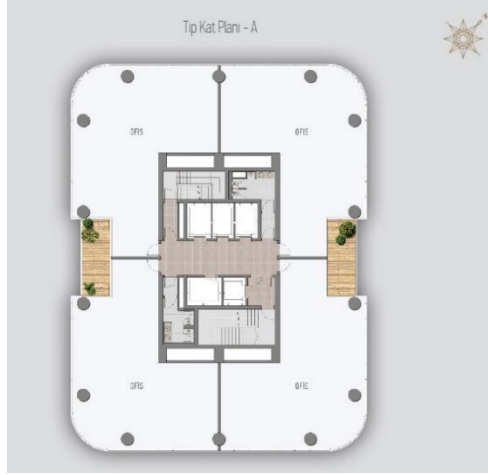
Plan of Besa Kule (Source: <http://www.yeniprojeler.com/3/0/vaziyet-ve-kat-plani/resimleri/besa-kule>)
